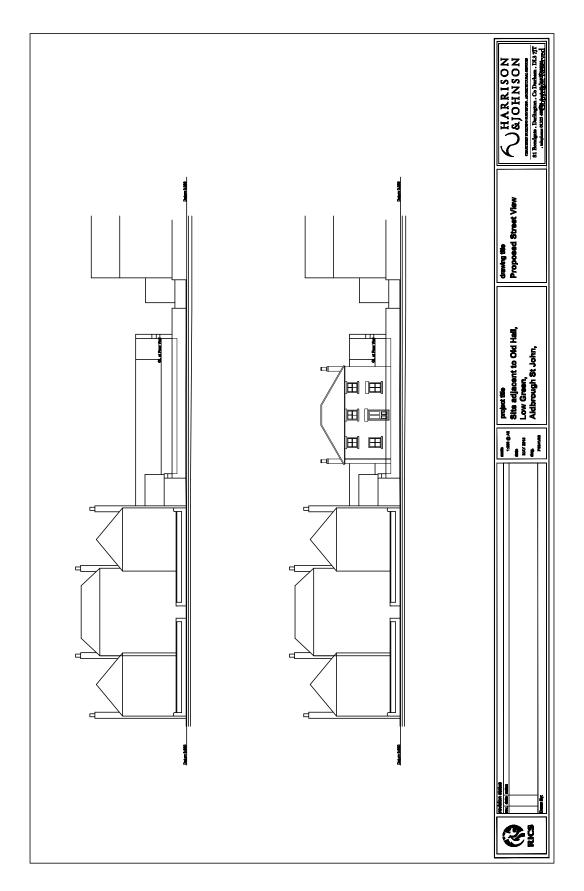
Existing and proposed street view (illustration prepared by Harrison and Johnson Architects)
